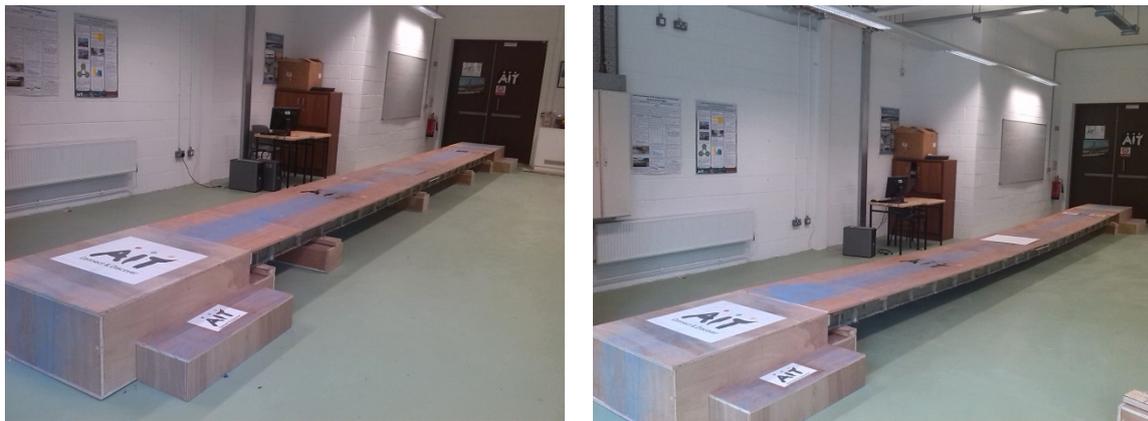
Completed Laboratory Scale FRP Composite Footbridge
